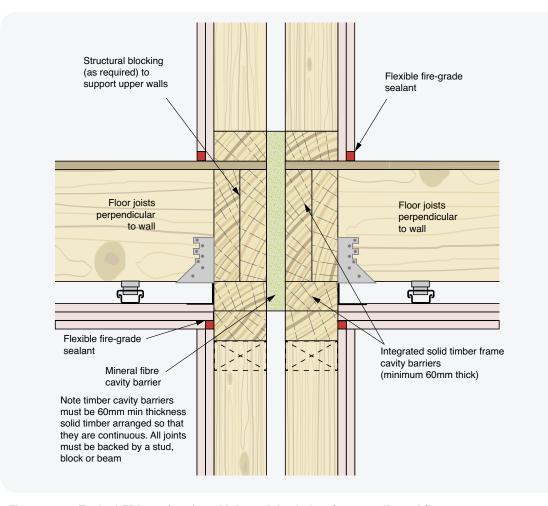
Typical FRL 120/120/120 Light-weight timber frame walls and floors.
